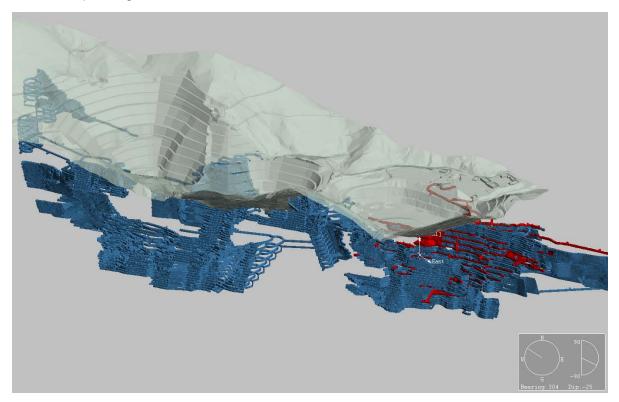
Çukuralan Perspective View Long Sections
